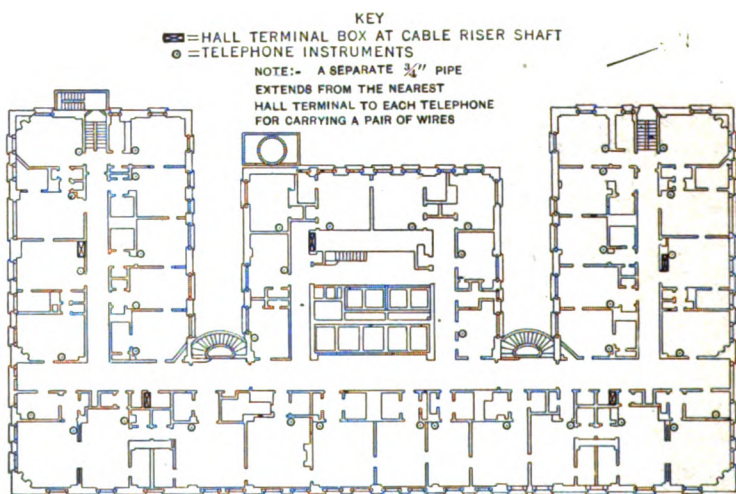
18-STORY HOTEL, TYPICAL FLOOR PLAN.
